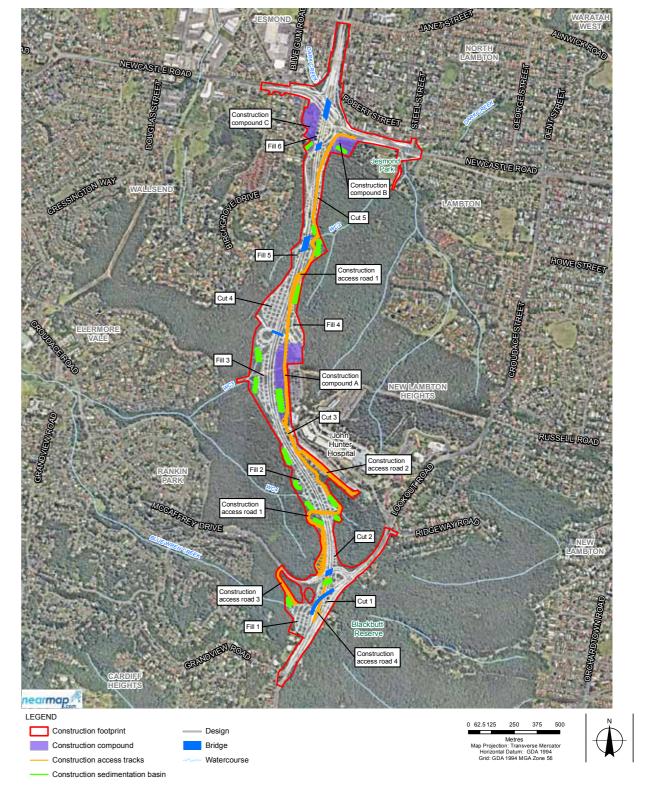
Plan illustrating the project's construction ancillary facilities.
